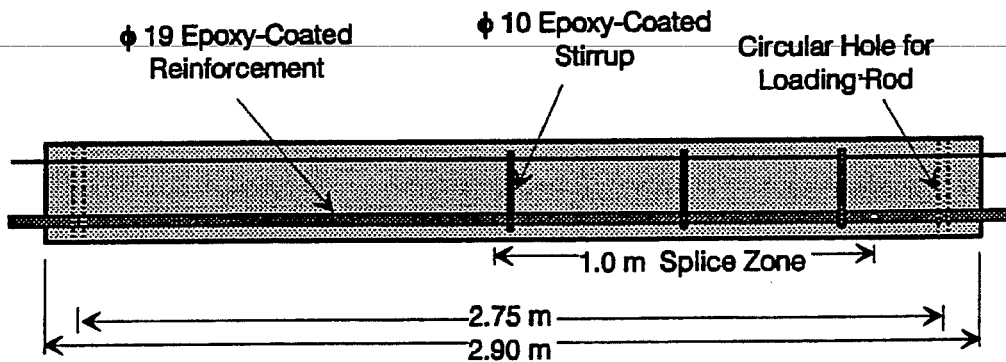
Details of Group III Beam Specimen (All Bars) [Kahhaleh, 1994].
